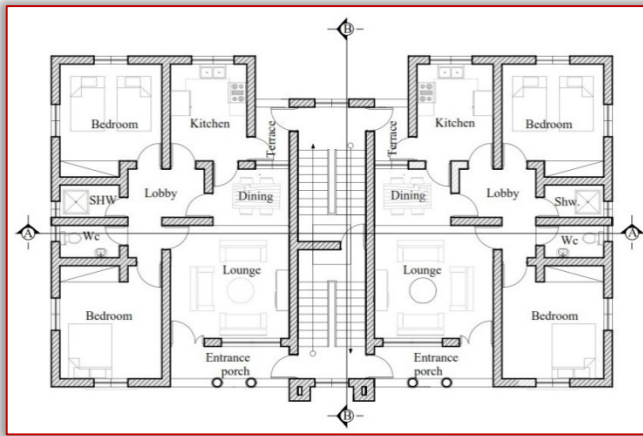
1<sup>st</sup> and 2<sup>nd</sup> floor plans for low income earners' apartment building
